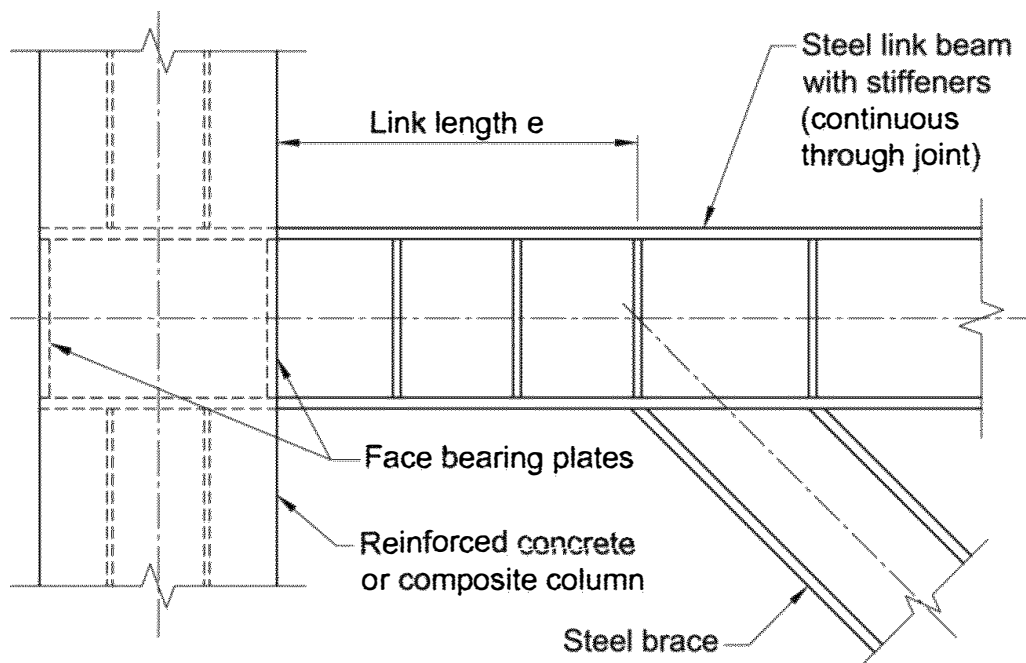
Reinforced concrete (or composite) column-to-steel eccentric brace.
